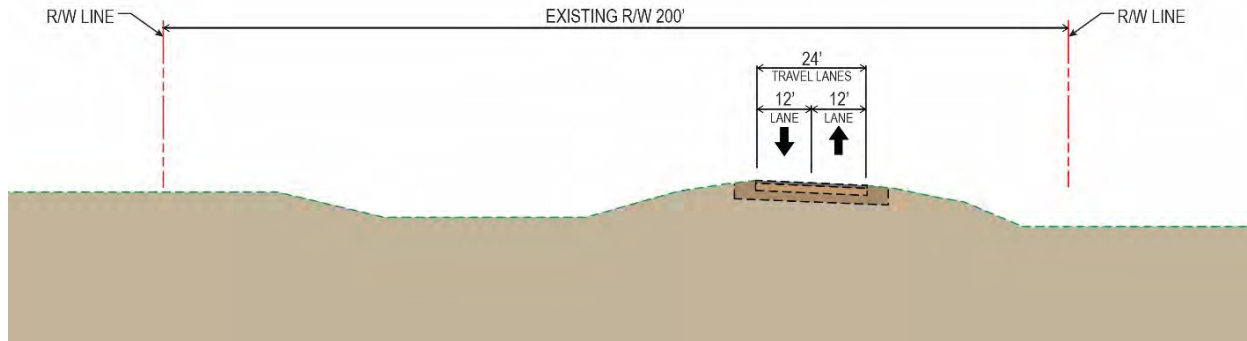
Existing Typical Section from US 92/SR 600 to I-95 SB Ramps
